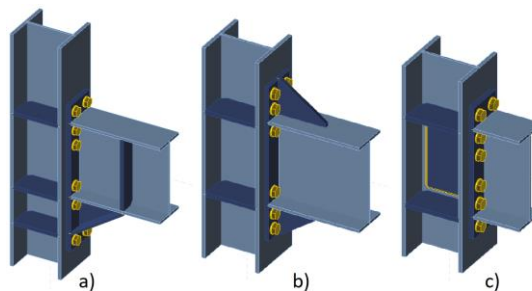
a) Haunched joint, b) Extended stiffened end plate joint, c) Unstiffened end plate joint
